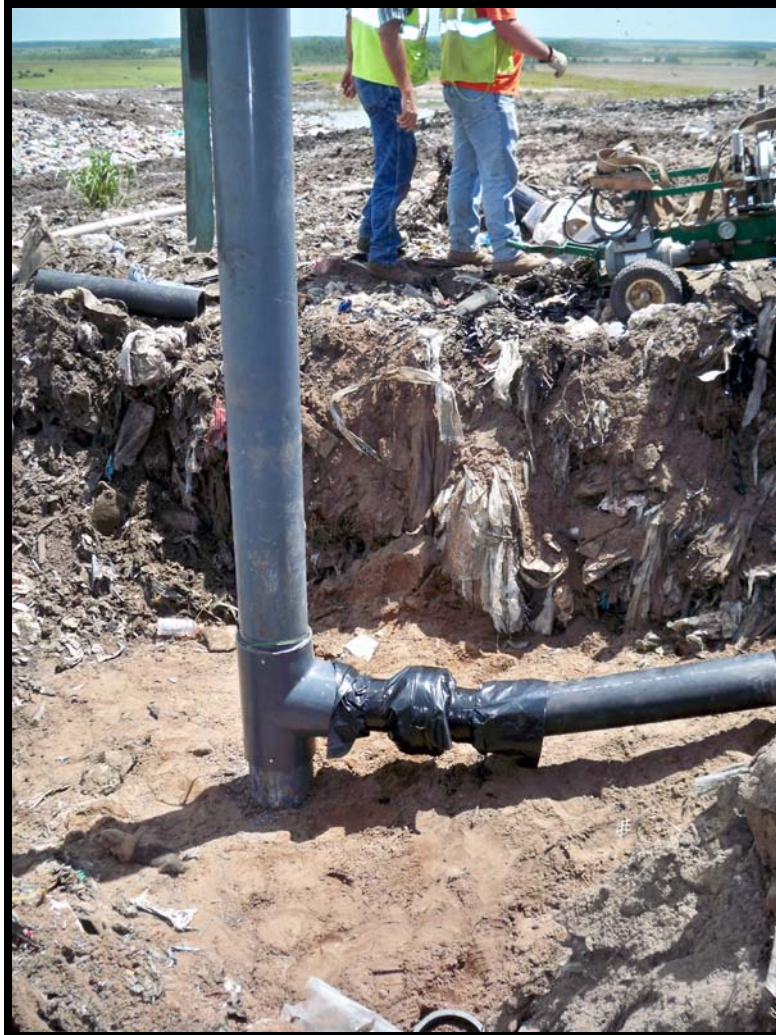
Lag bolting 8" PVC tee at remote well GW-36 to provide additional support at joints.
